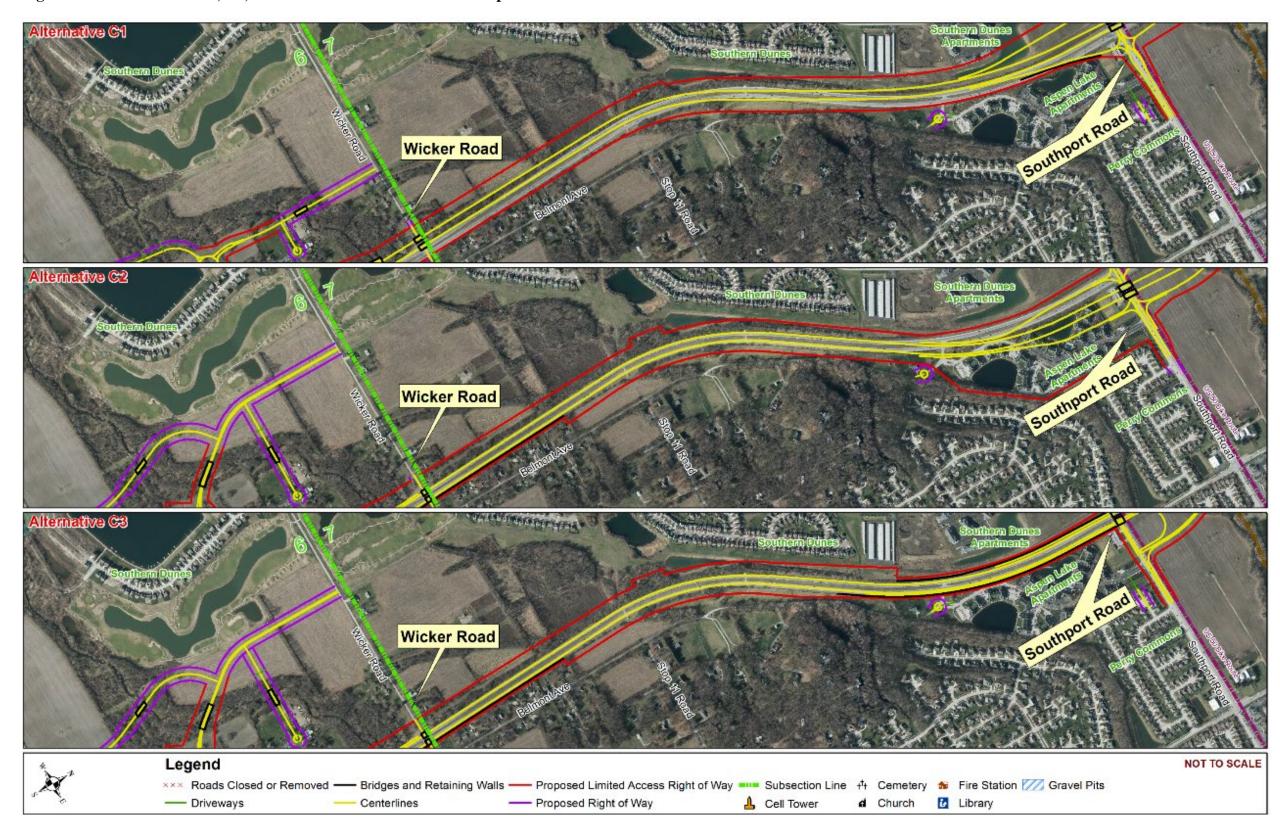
Alternatives C1, C2, and C3 from Wicker Road to Southport Road
